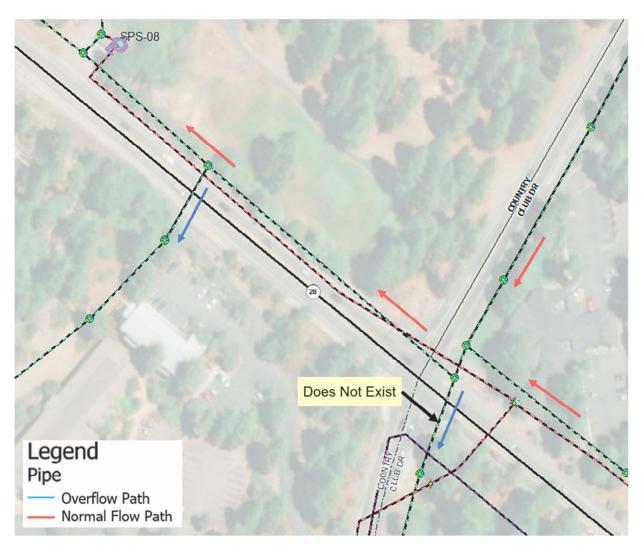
Country Club Drive & Highway 28 Sewer Overflow
